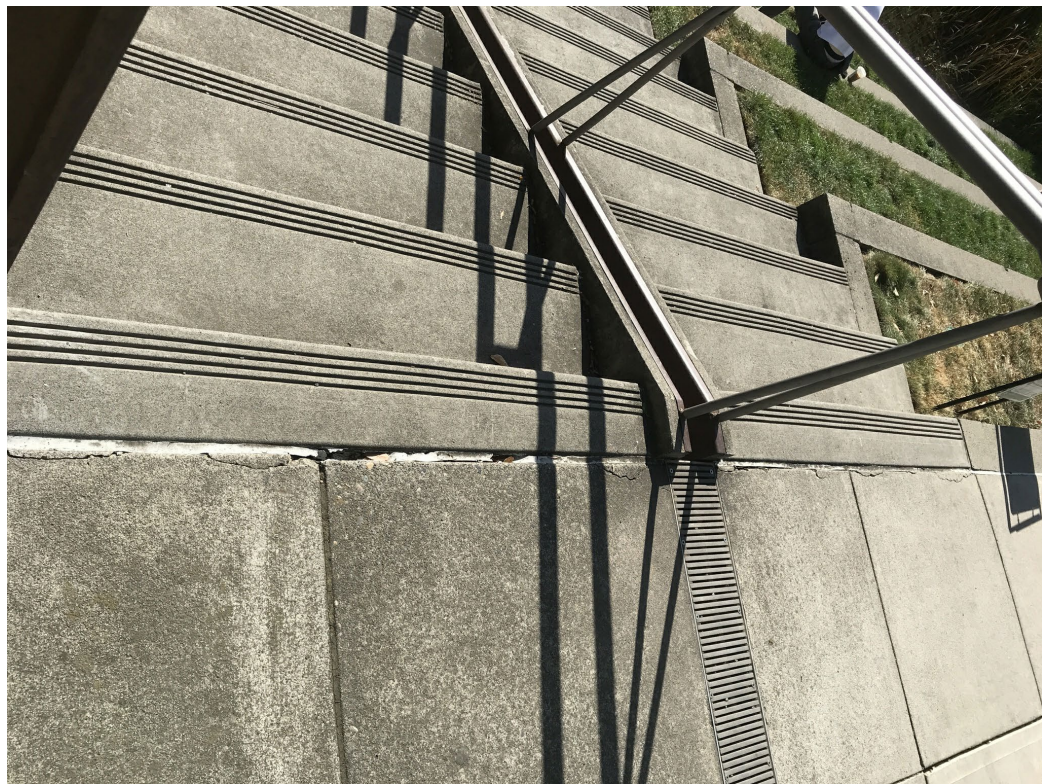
cracks in pavement and work caulking at the top of the stairs
